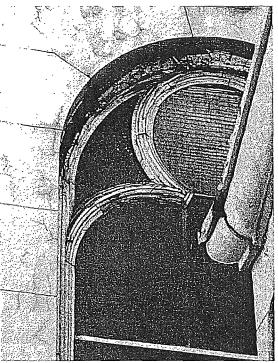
East façade, transept window, showing soiling, paint loss and rotting/loss of tracery elements.
